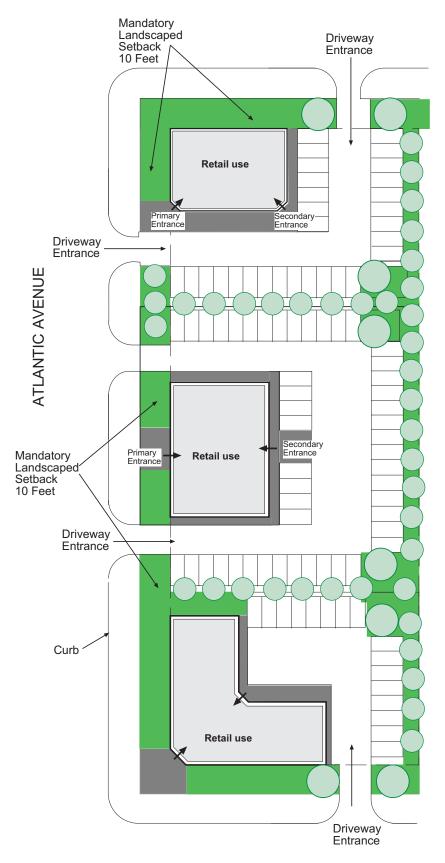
Typical block plan: Typical block plan: Auto-oriented subarea
